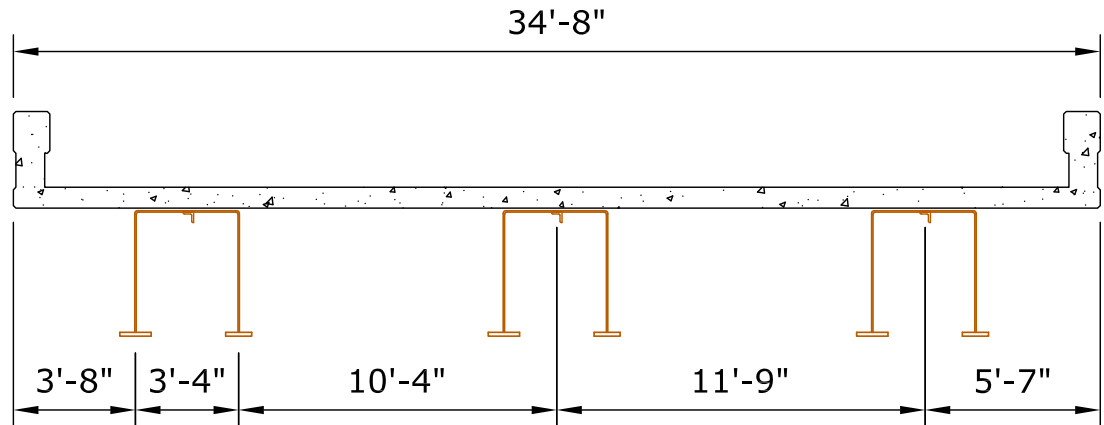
Bridge Cross-Section for 105' Span Bridge
